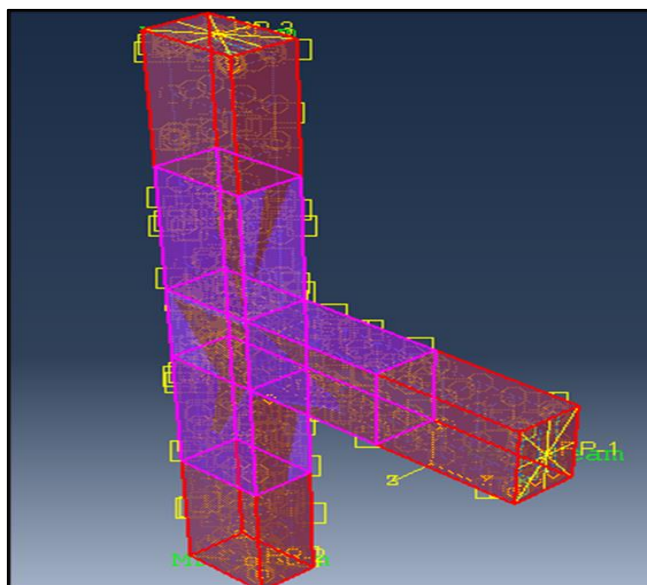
Model of exterior beam column joint retrofitted with single layer of CFRP sheet
